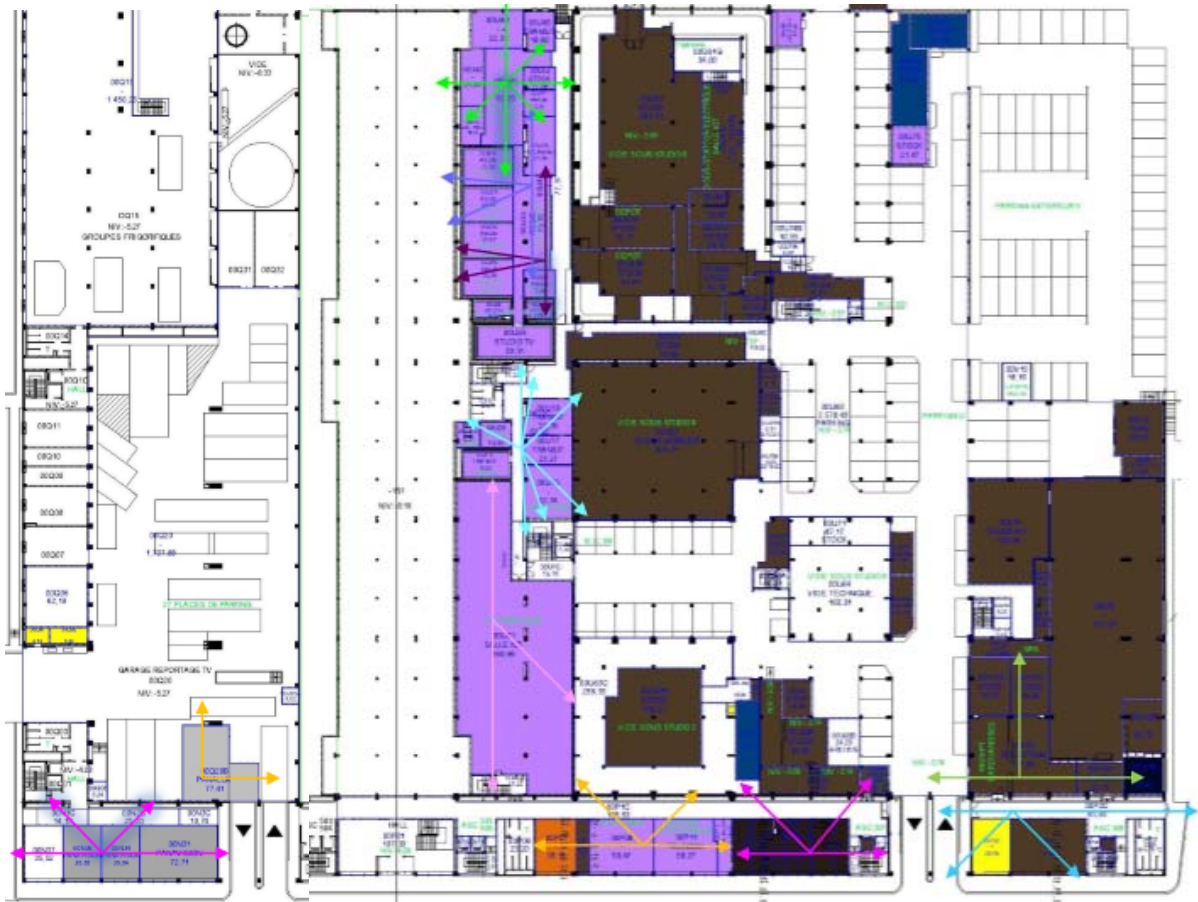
Design at 2.4 GHz for Ground Floor in Building CHJM
